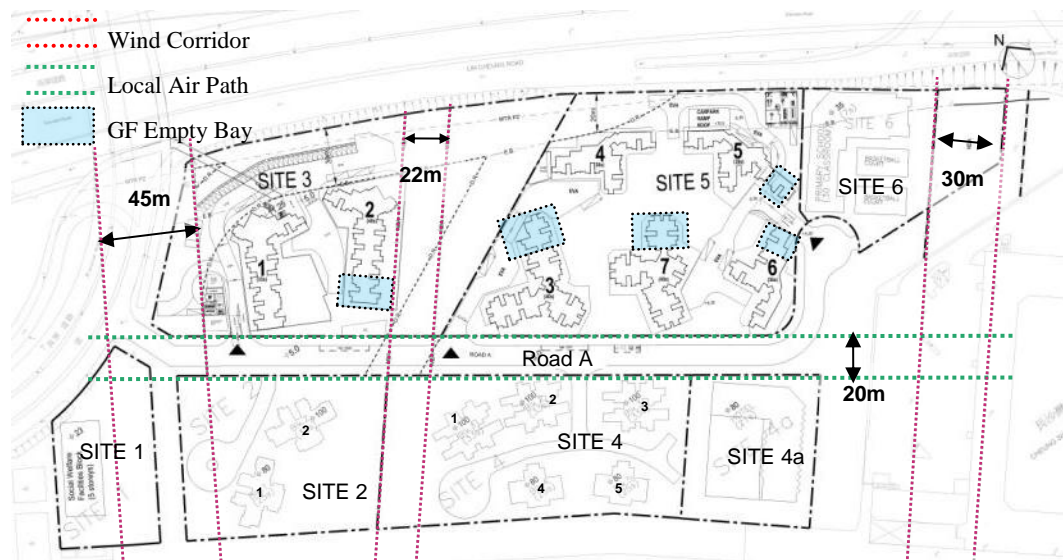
Master Layout plan of Indicative Scheme for CSWWFM Ph. 2 Site
